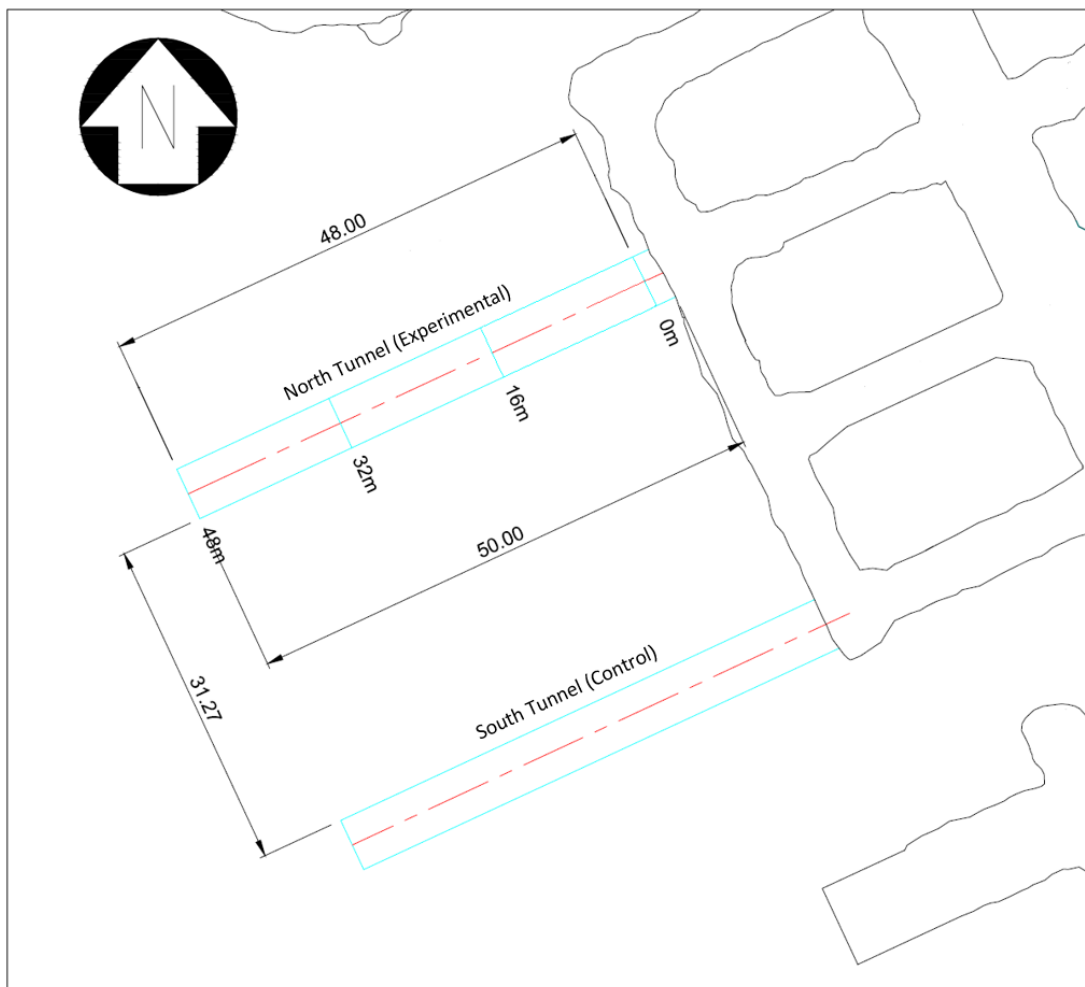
Detailed plan view of two parallel tunnels constructed for the experiment.
